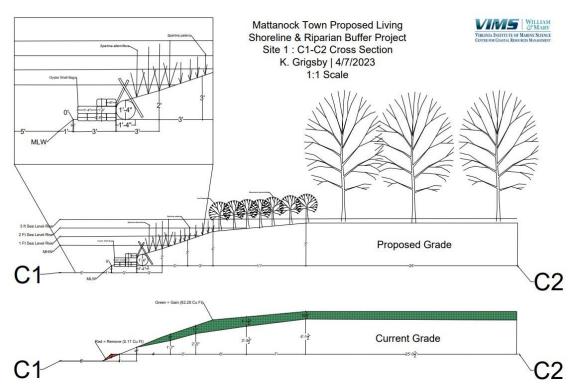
Cross-section C1-C2 created to illustrate the proposed grade and in this case, the additional soil needed to achieve the desired elevations. K. Grigsby, 2023.
